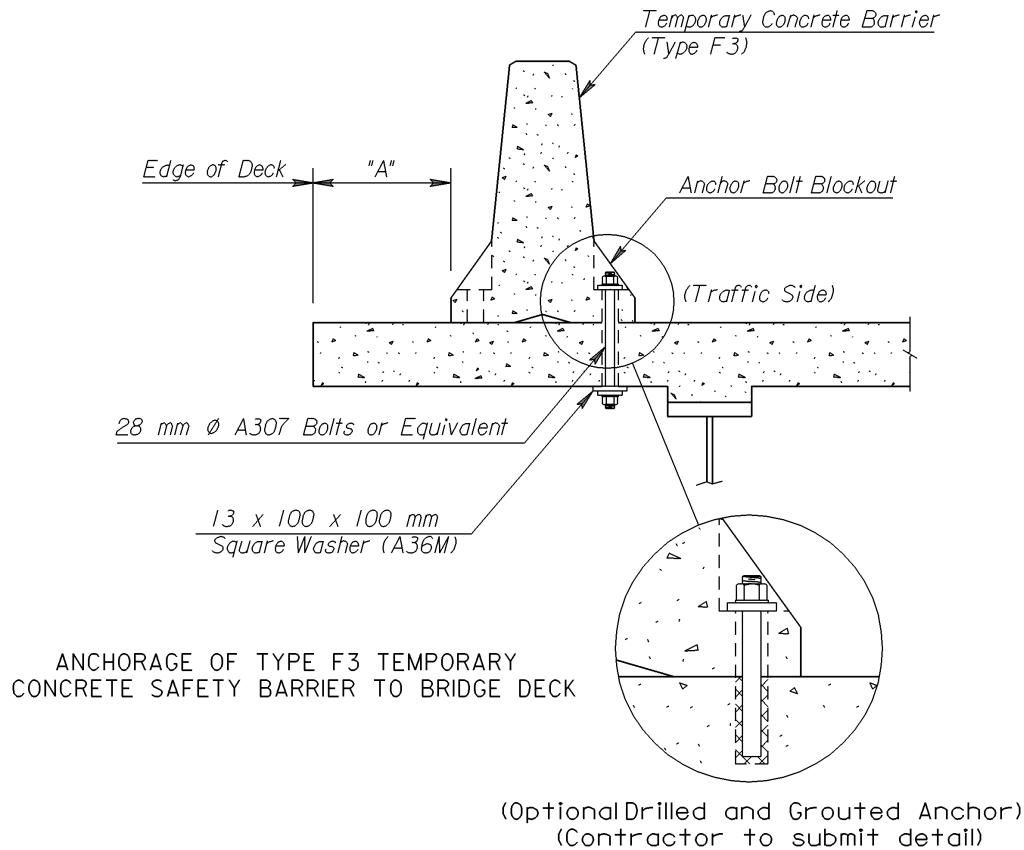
2 Anchorage of Type F3 Temporary Safety Barrier to Bridge Deck
